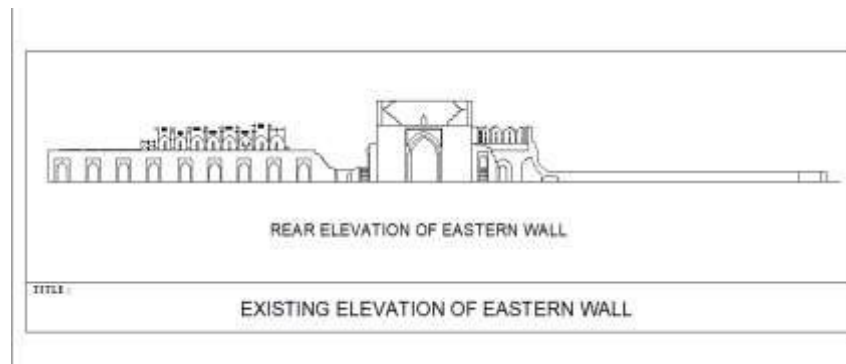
Plan of Existing Elevation (Rear Elevation) of Easter Wall of Rewat Fort (after Saeed2020, p. 50)
